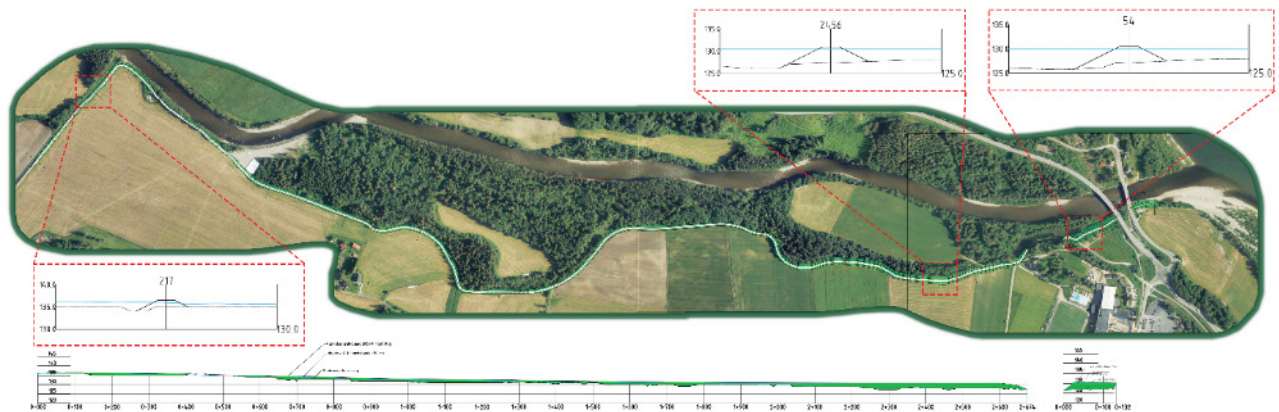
Top view, lengthwise section and some average cross sections of the planned receded flood barrier.
